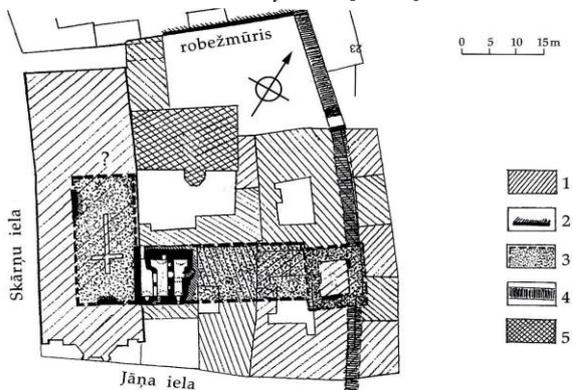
Archaeologist, Dr. habil. hist., Professor Andris Caune. Reconstruction of Riga Bishop's first yard (1201–1234) planning: 1 – current buildings, 2 – identified Bishop's residence wall fragments, 3 – reconstructed layout of Bishop's residence buildings, 4 – defence wall of Riga, 5 – building in whose cellar excavations carried out in 1992. 1999 [10, 225].
